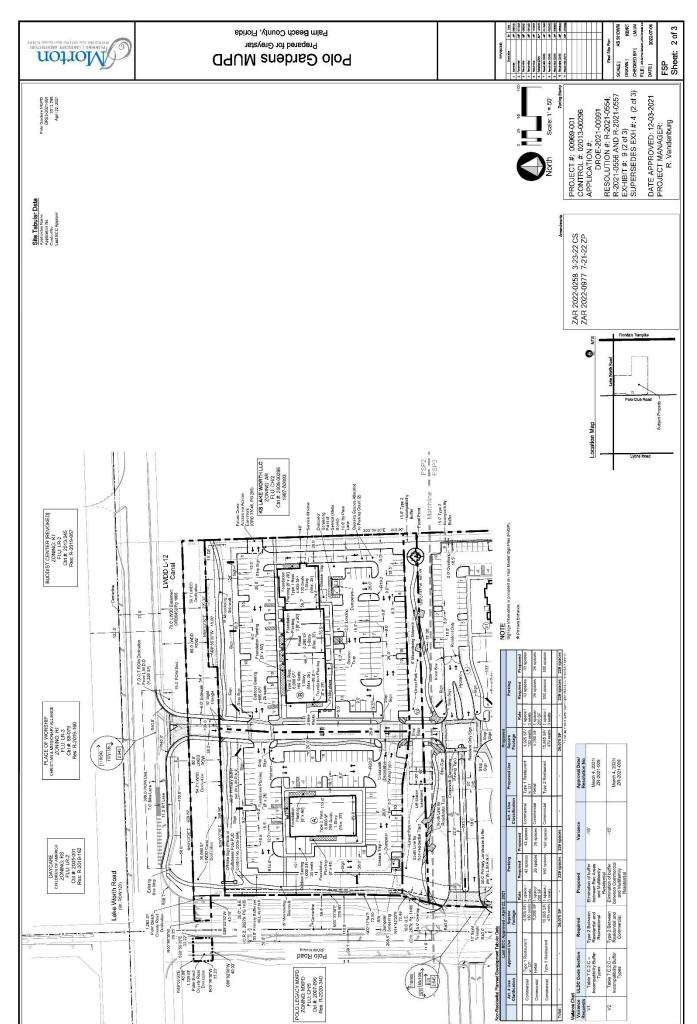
Approved Site Plan Dated December 3, 2021 (Page 2 of 3)
